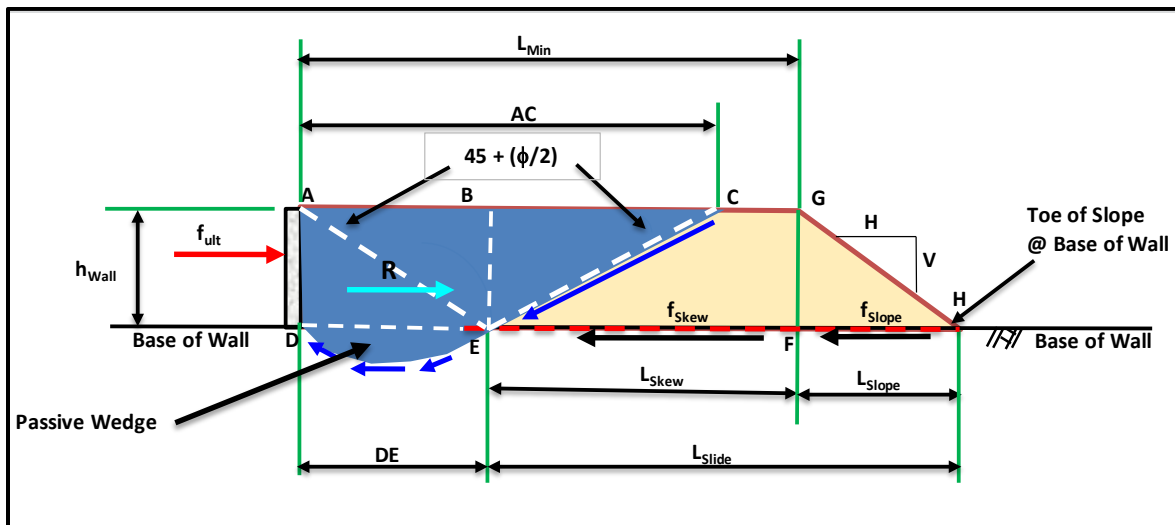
, Skewed Bridge Abutment Wall Seismic Sliding Resistance
